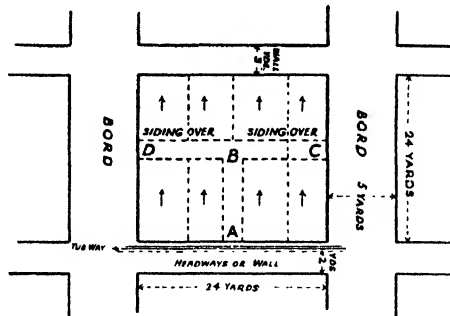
METHOD OF WORKING PILLARS AT GARESFIELD.
